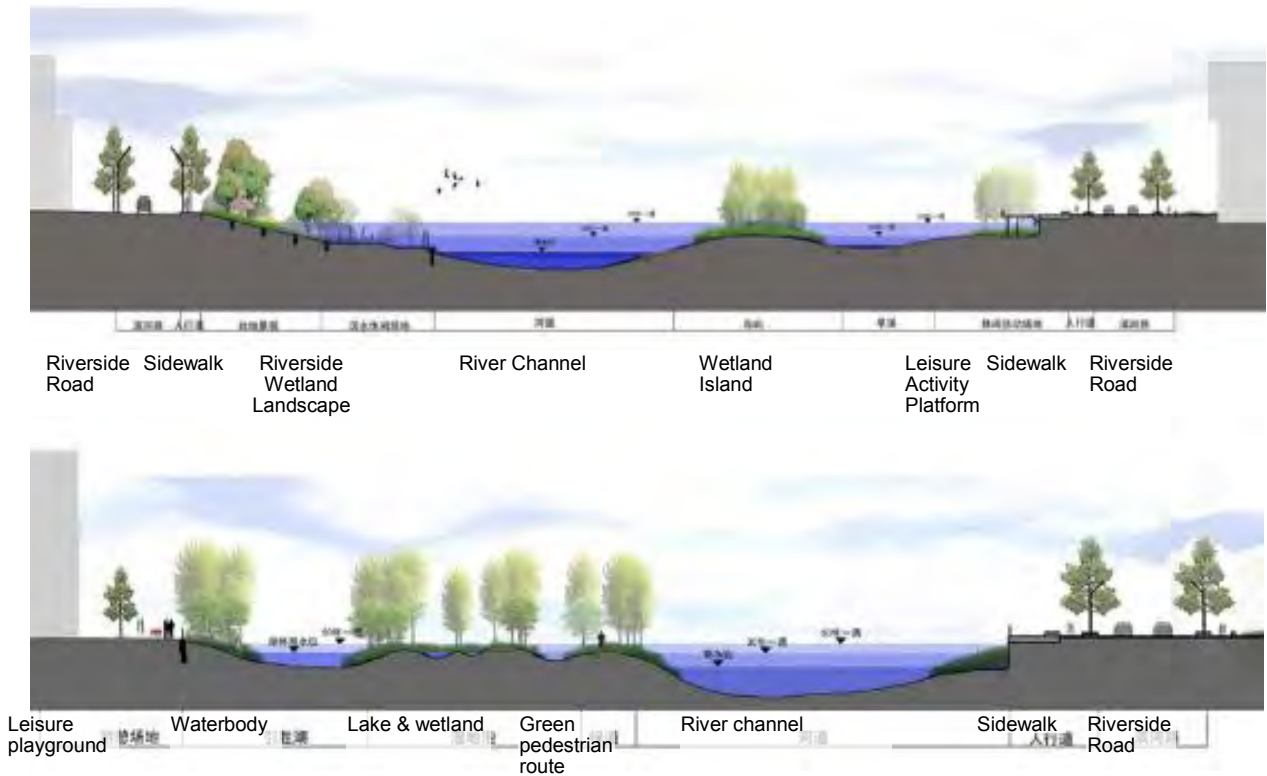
and b: Proposed river sections in Ledu urban area (channel and parkland)
